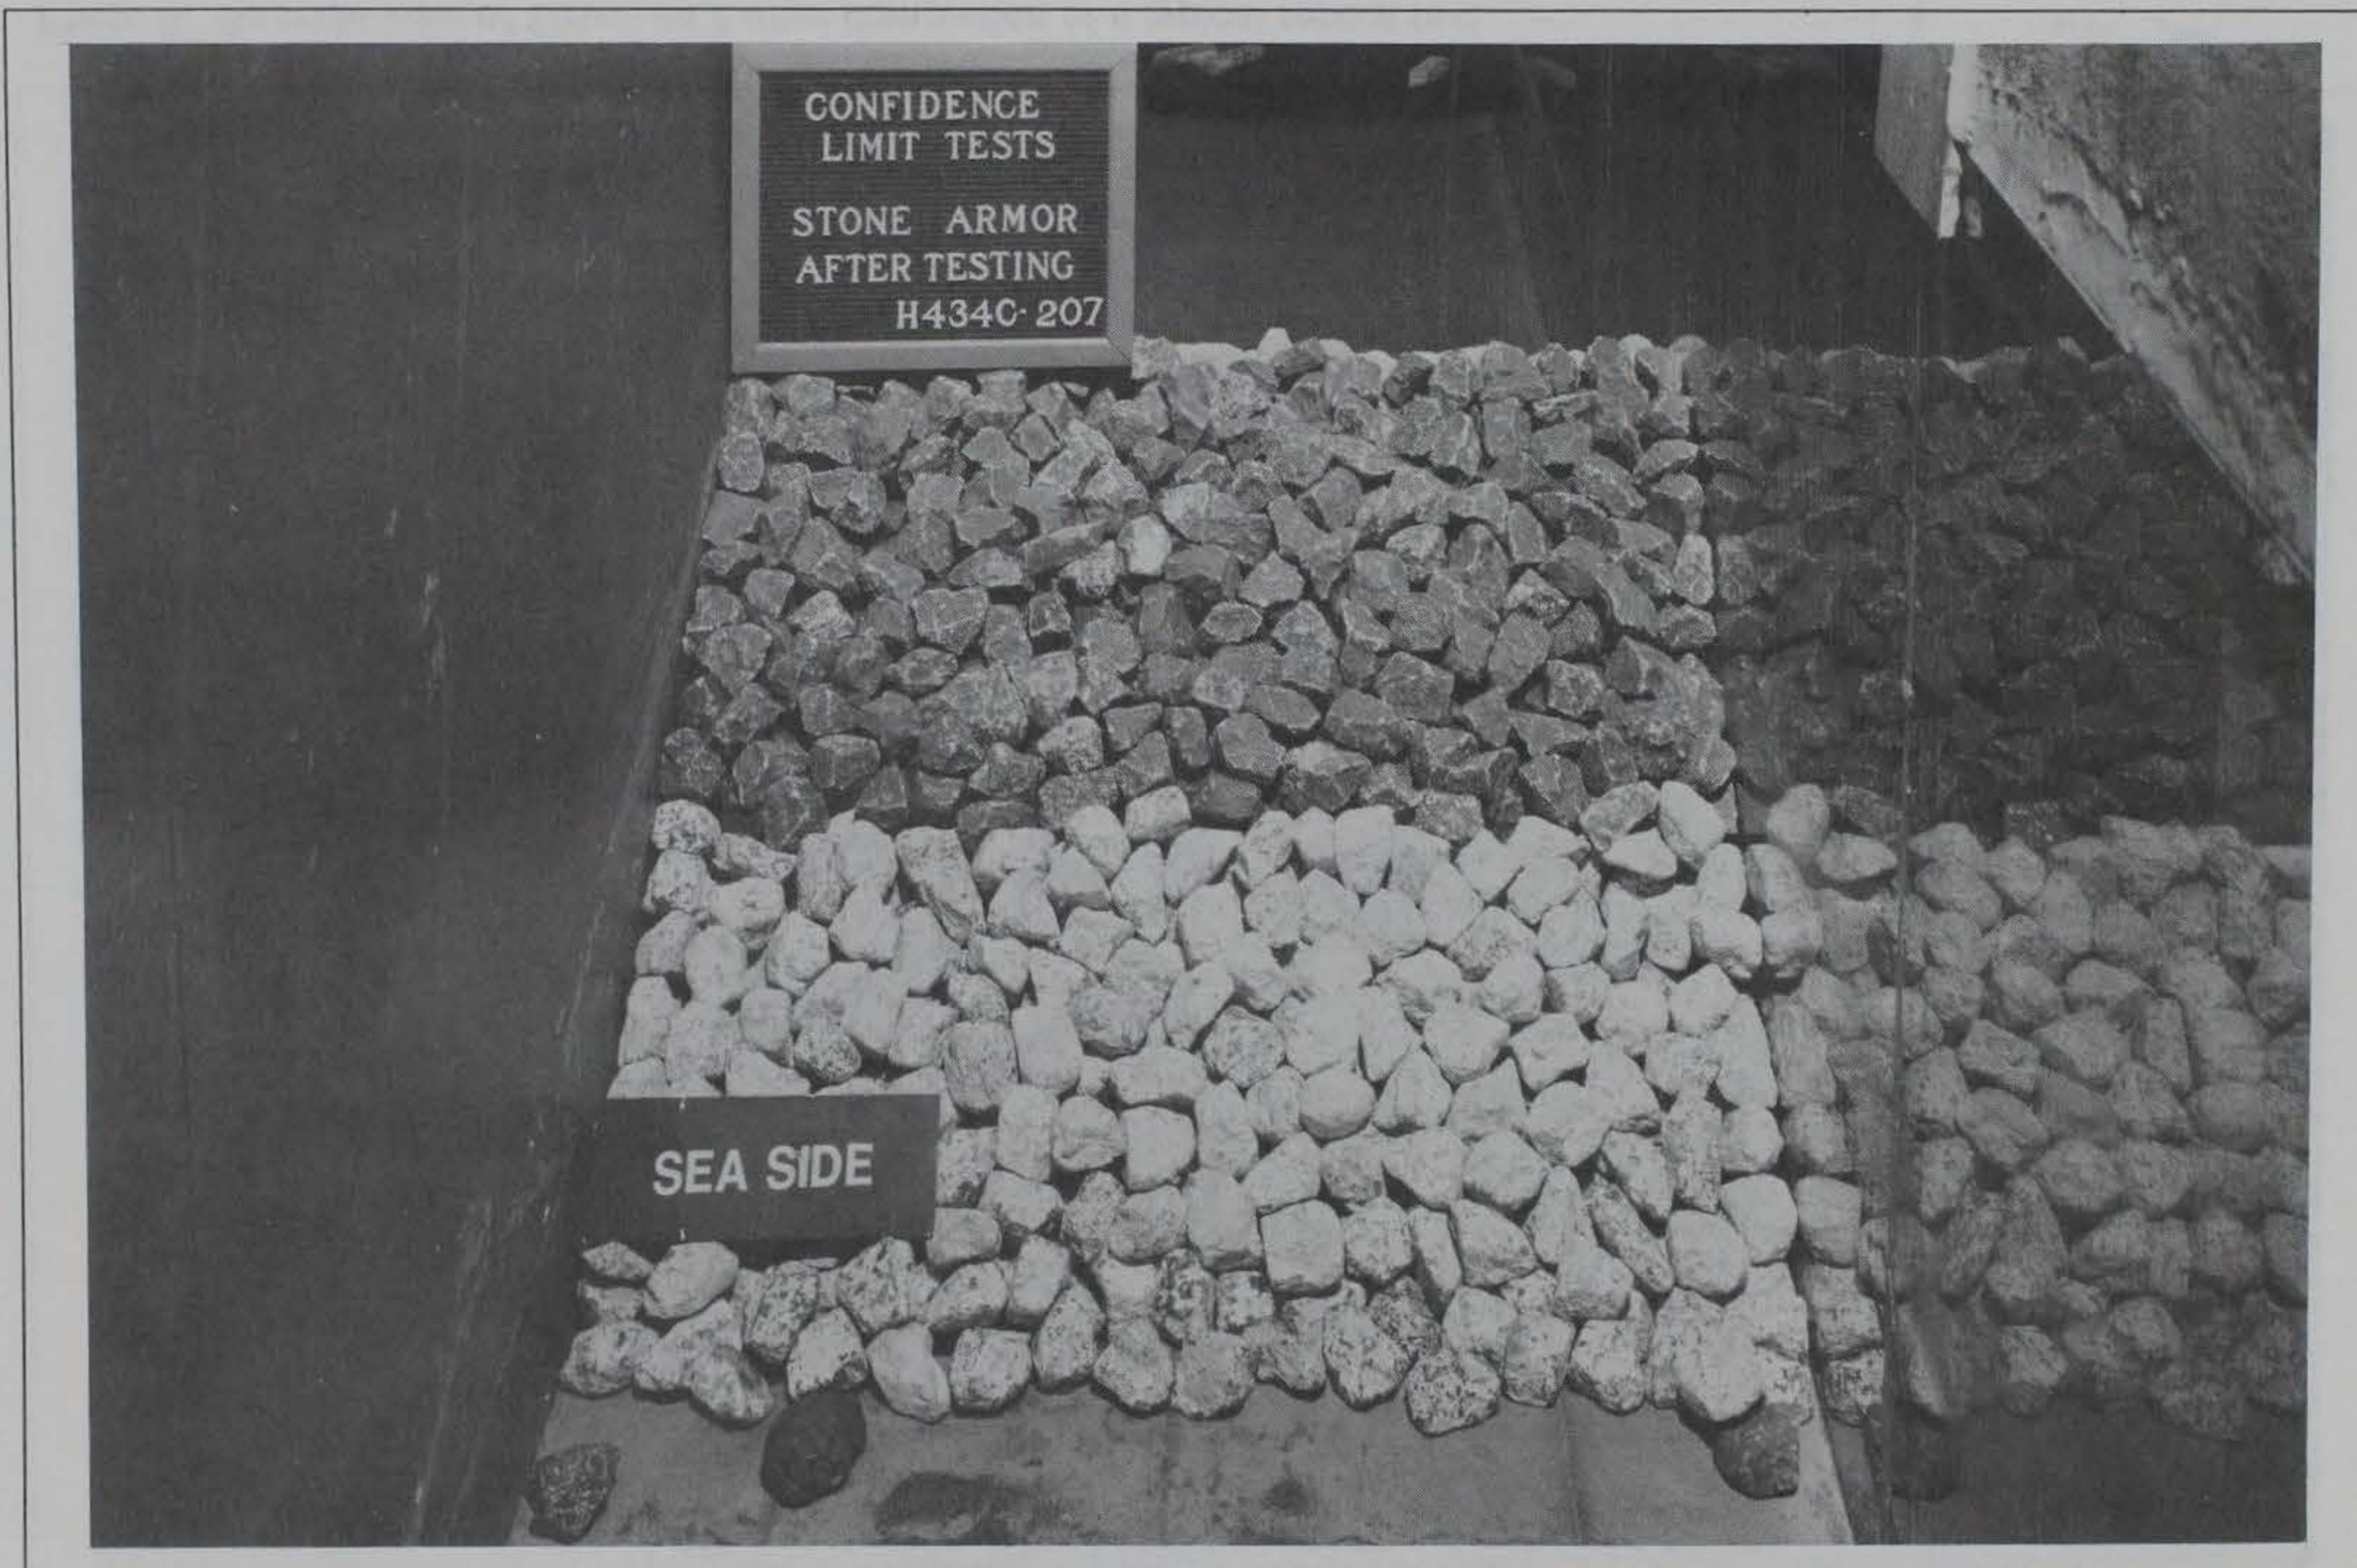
Seaside view of Structure 1 after completion of a typical repeat test
